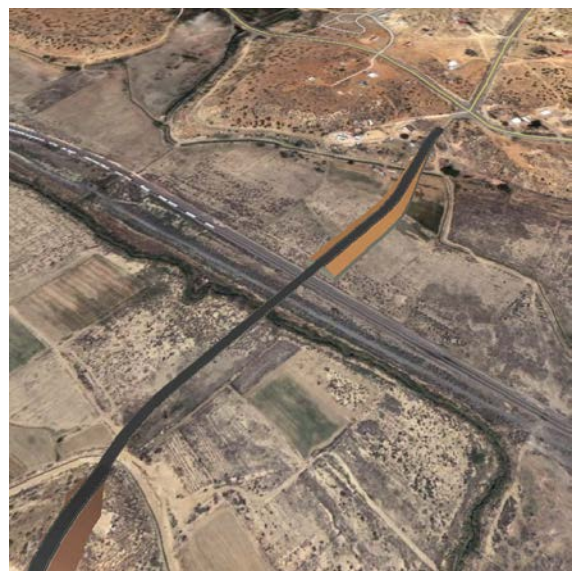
MODEL OF PROPOSED MESA HILL BRIDGE
